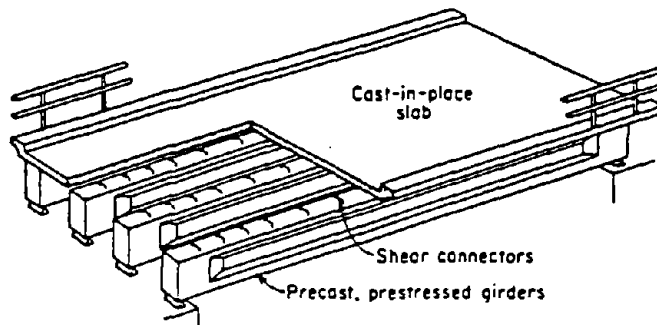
Composite Prestressed-Concrete Bridge (Winter & Nilson 1979)
